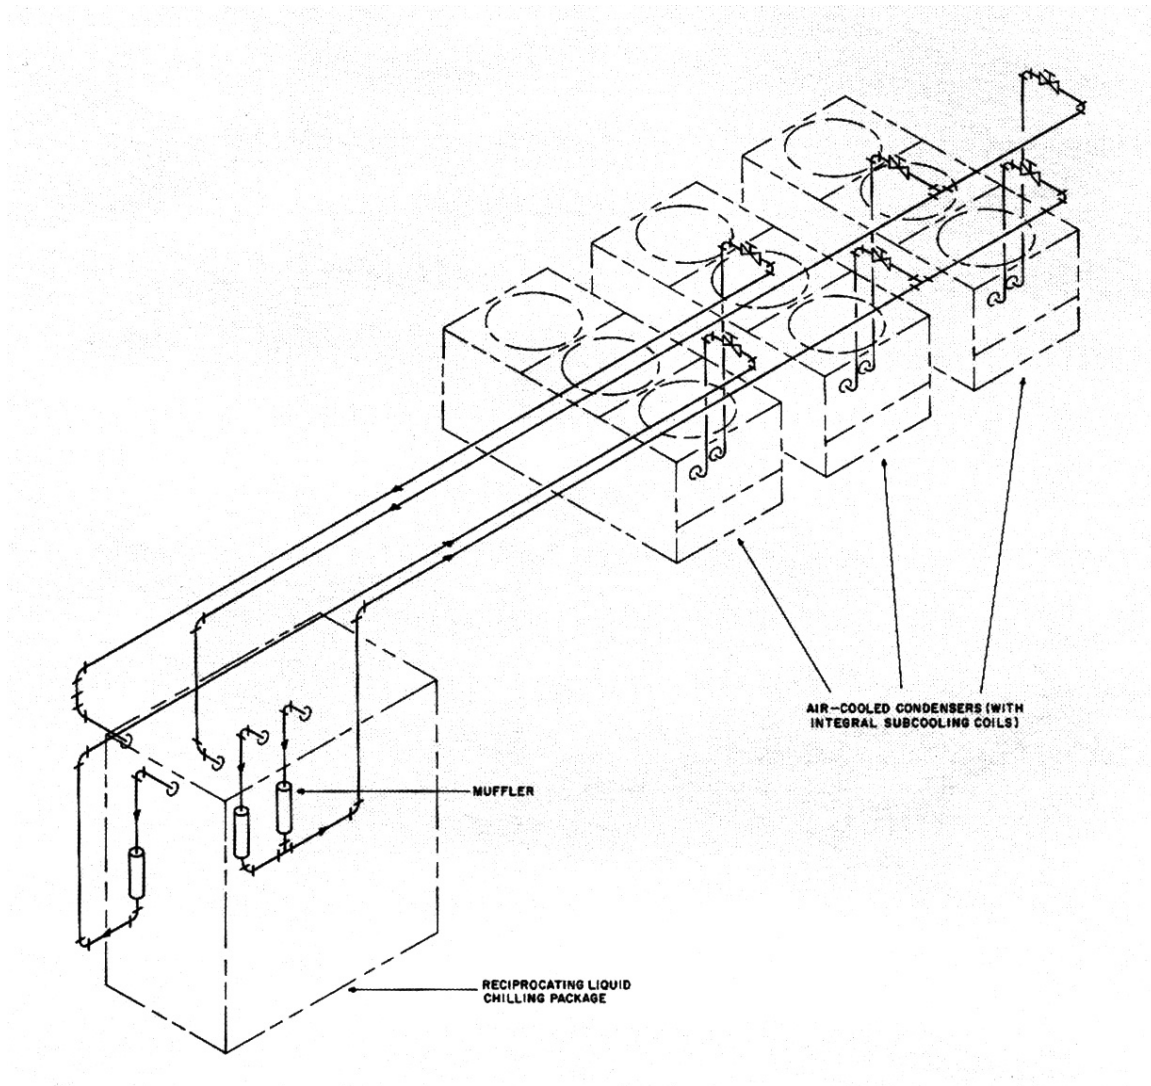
Reciprocating Liquid Chilling Package with Air-Cooled Condensers, Three Compressors
